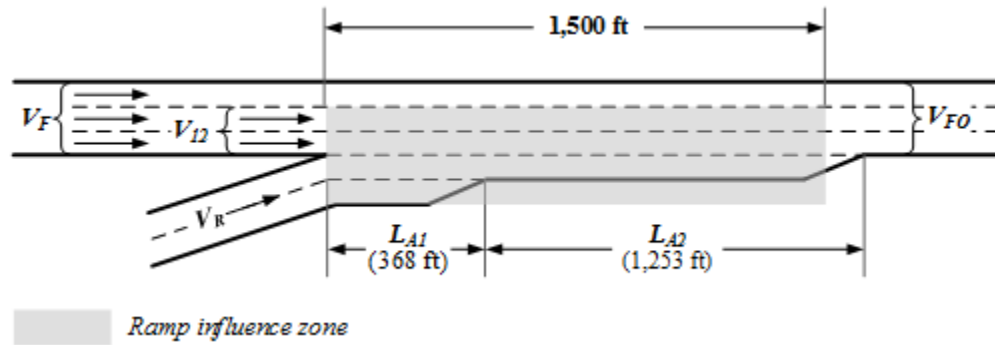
Schematic Illustration of a Typical On-Ramp Freeway Junction
